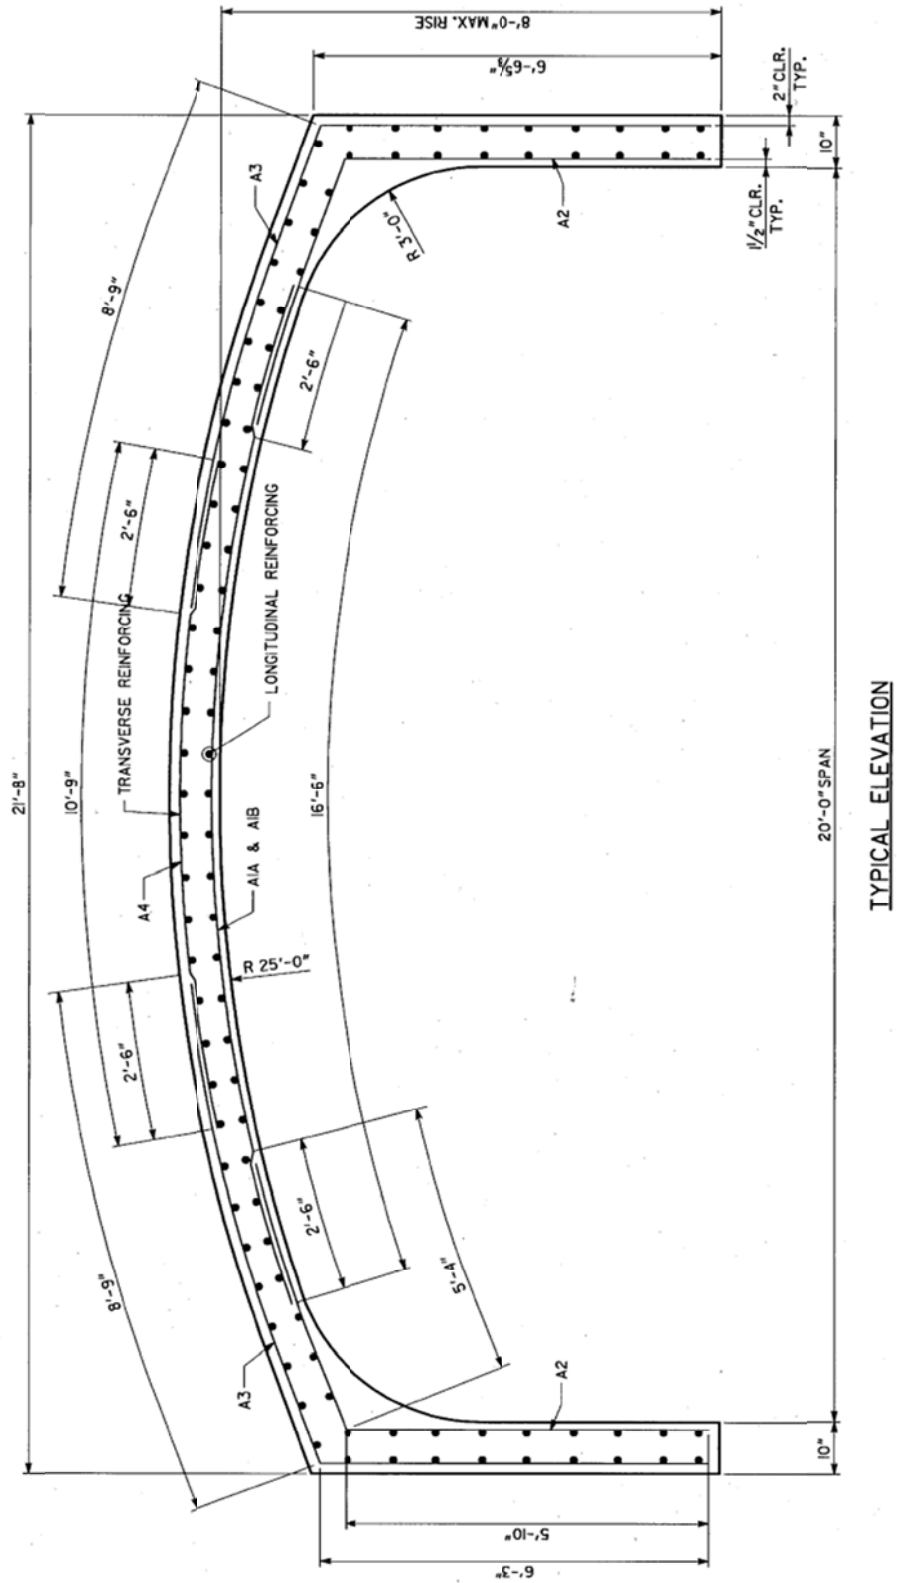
20 ft Bridge Unit Reinforcement Layout (FoleyArch 2010)
